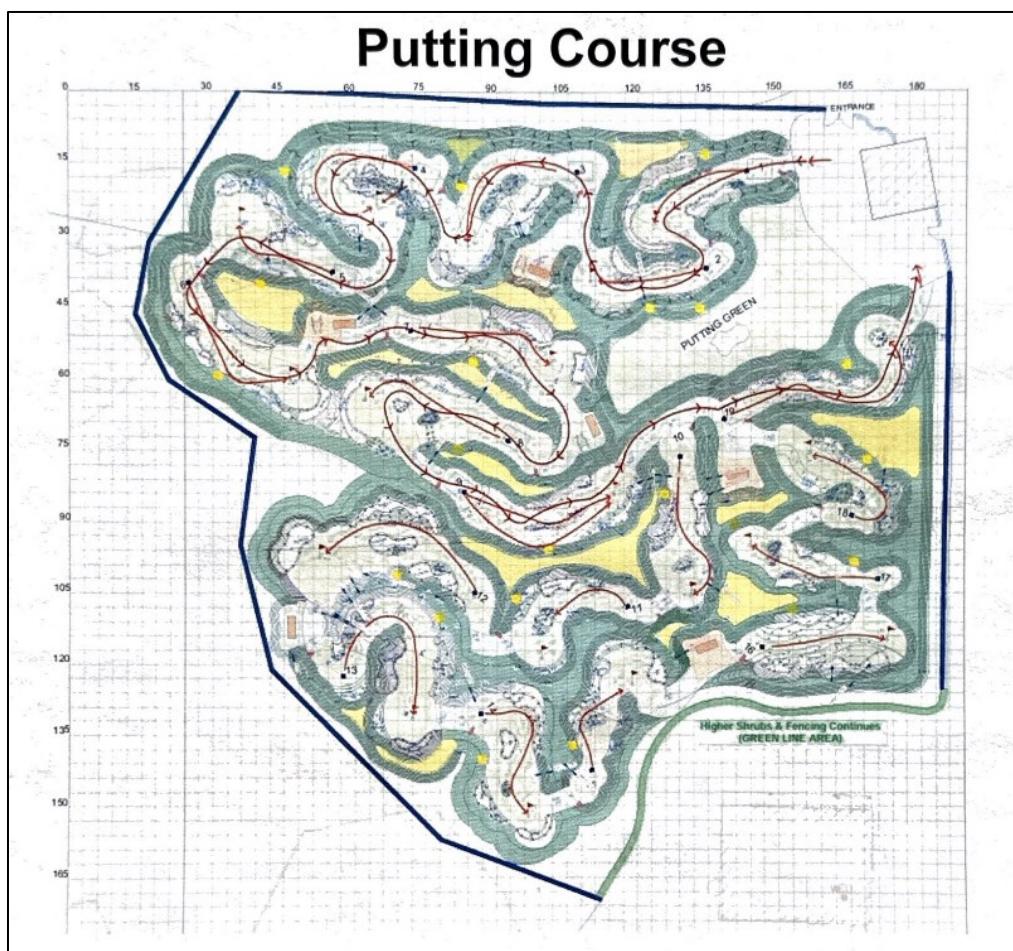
Excerpt from Submitted Application Materials, Putting Course Layout Plan
